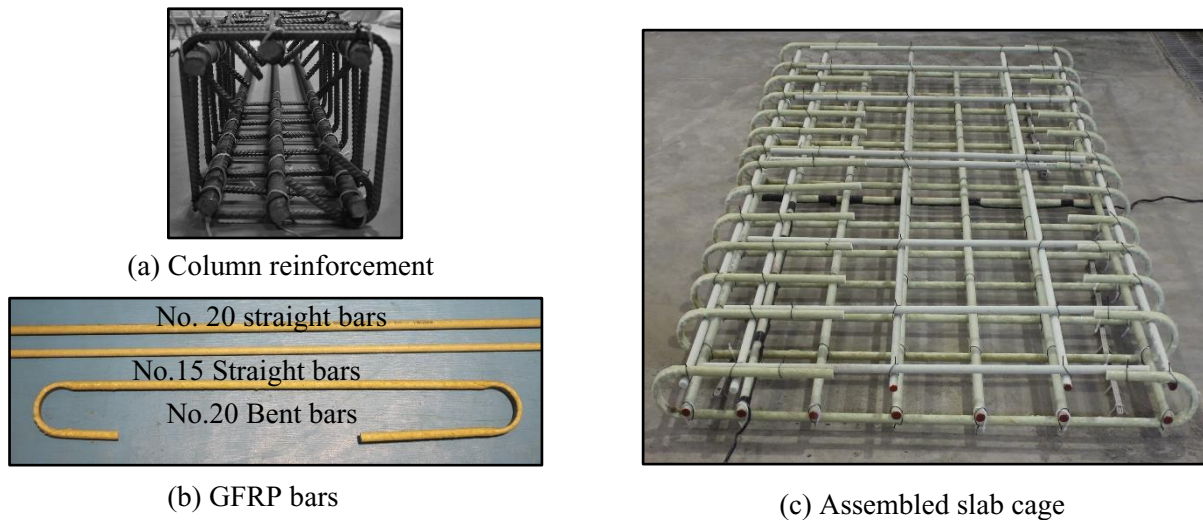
GFRP bars, connection reinforcement cage, and column-reinforcement details
